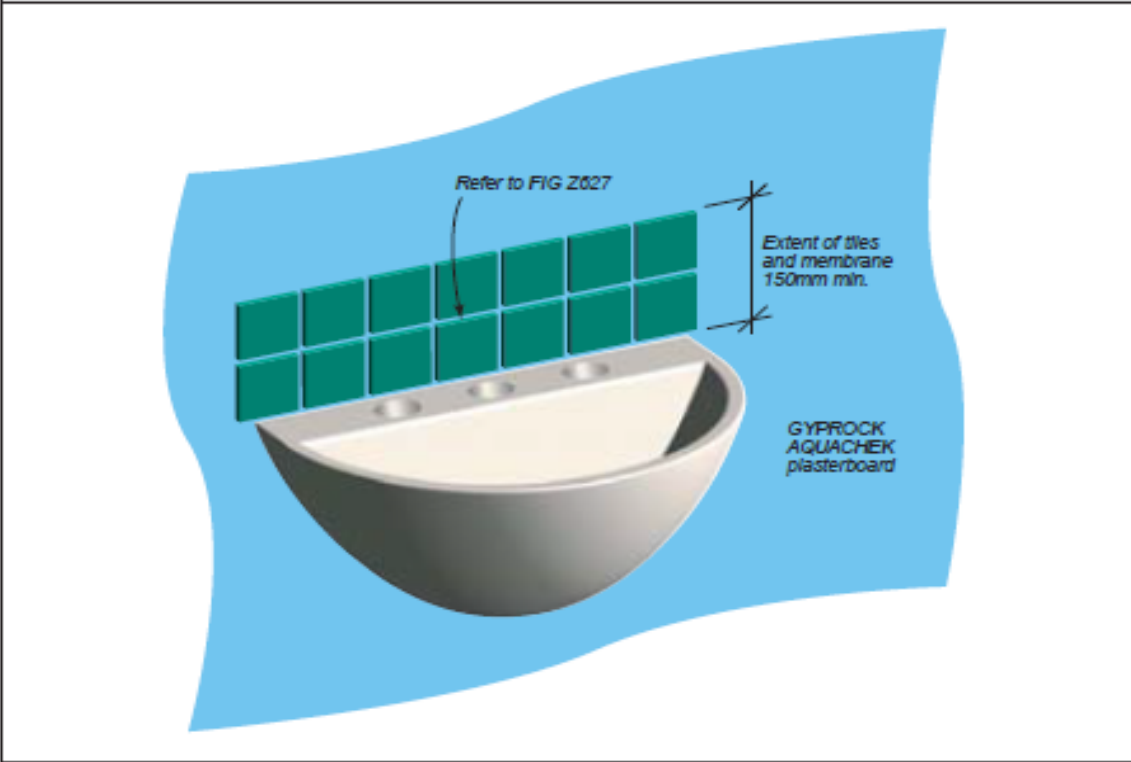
TYPICAL HAND BASIN – INSTALLATION DETAIL
